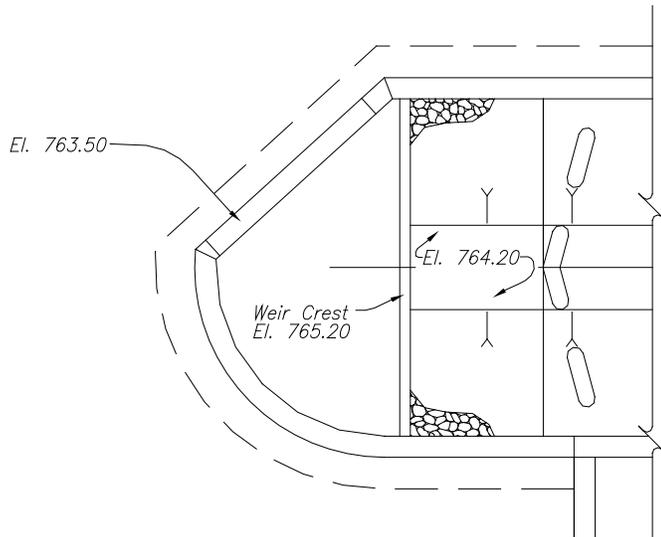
Plan view showing fishway exit weir and weir added at upstream end of fishway chute.
